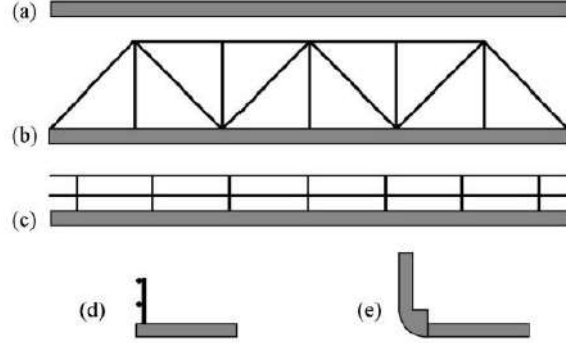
Schmocker and Hager, 2011, fig. 2, Investigated bridge types: Frontal view of (a) reference bridge; (b) truss bridge; (c) railing bridge; and cross-sections of (d) railing bridge and (e) baffle bridge.
